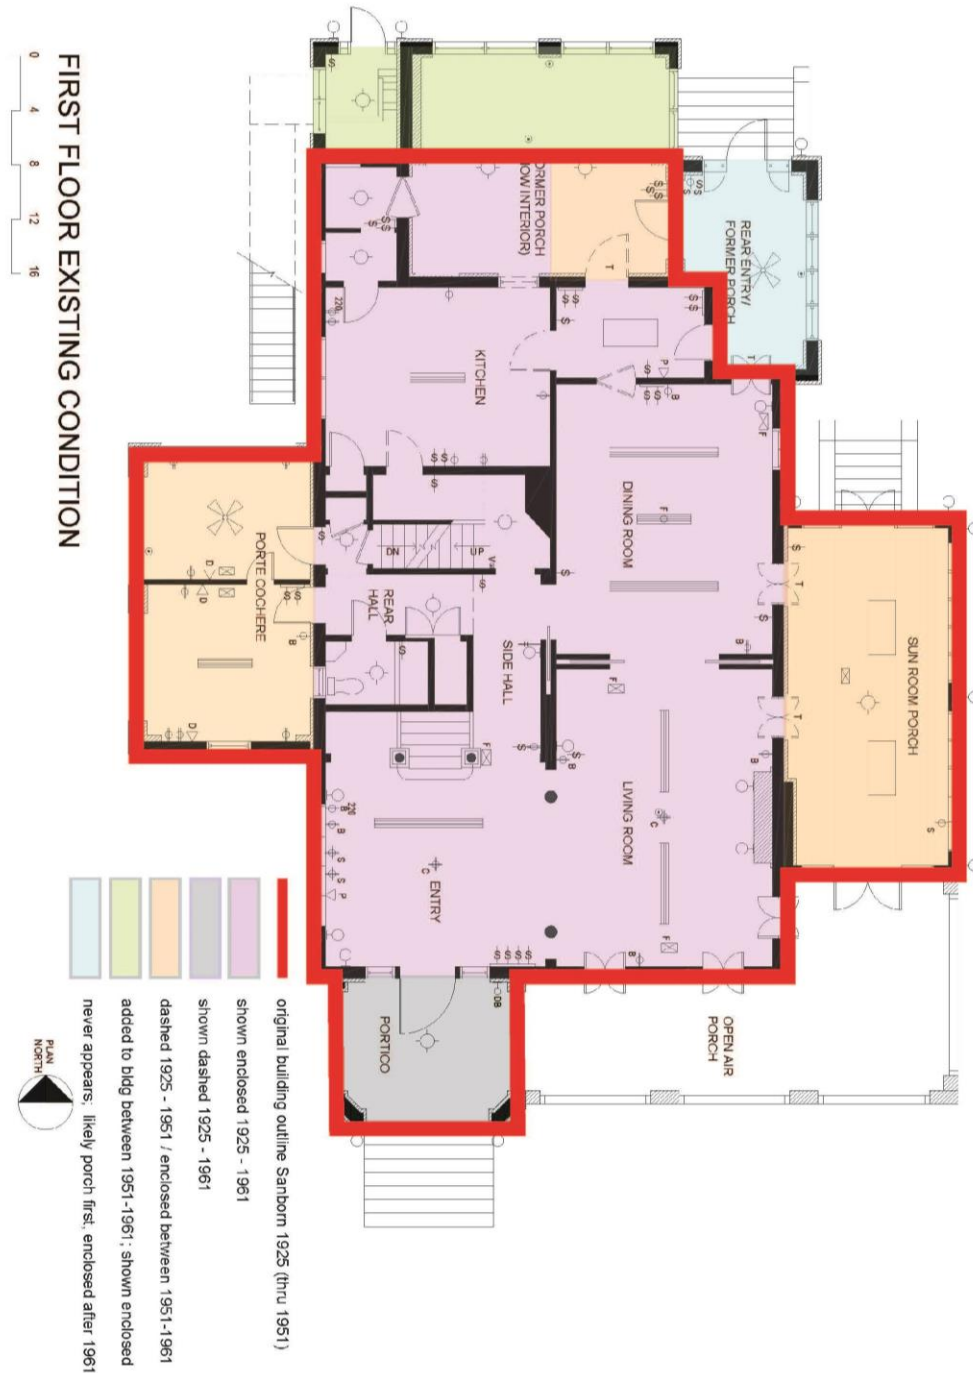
First Floor Plan with color coded overlay of additions and improvements
